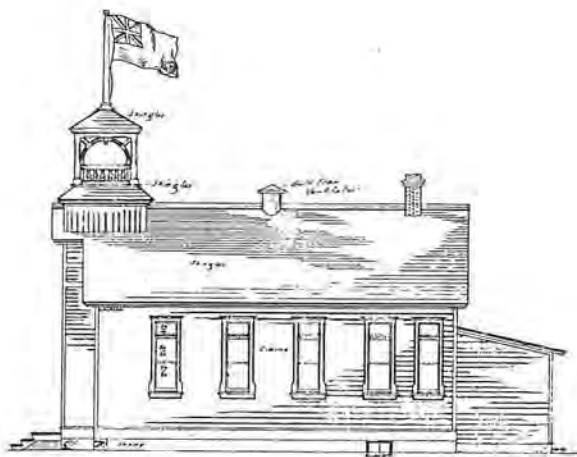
Design for Frame School Building, No. 2, 1903, showing the side elevation. (*The Western School Journal*, 1906, p. 235)
